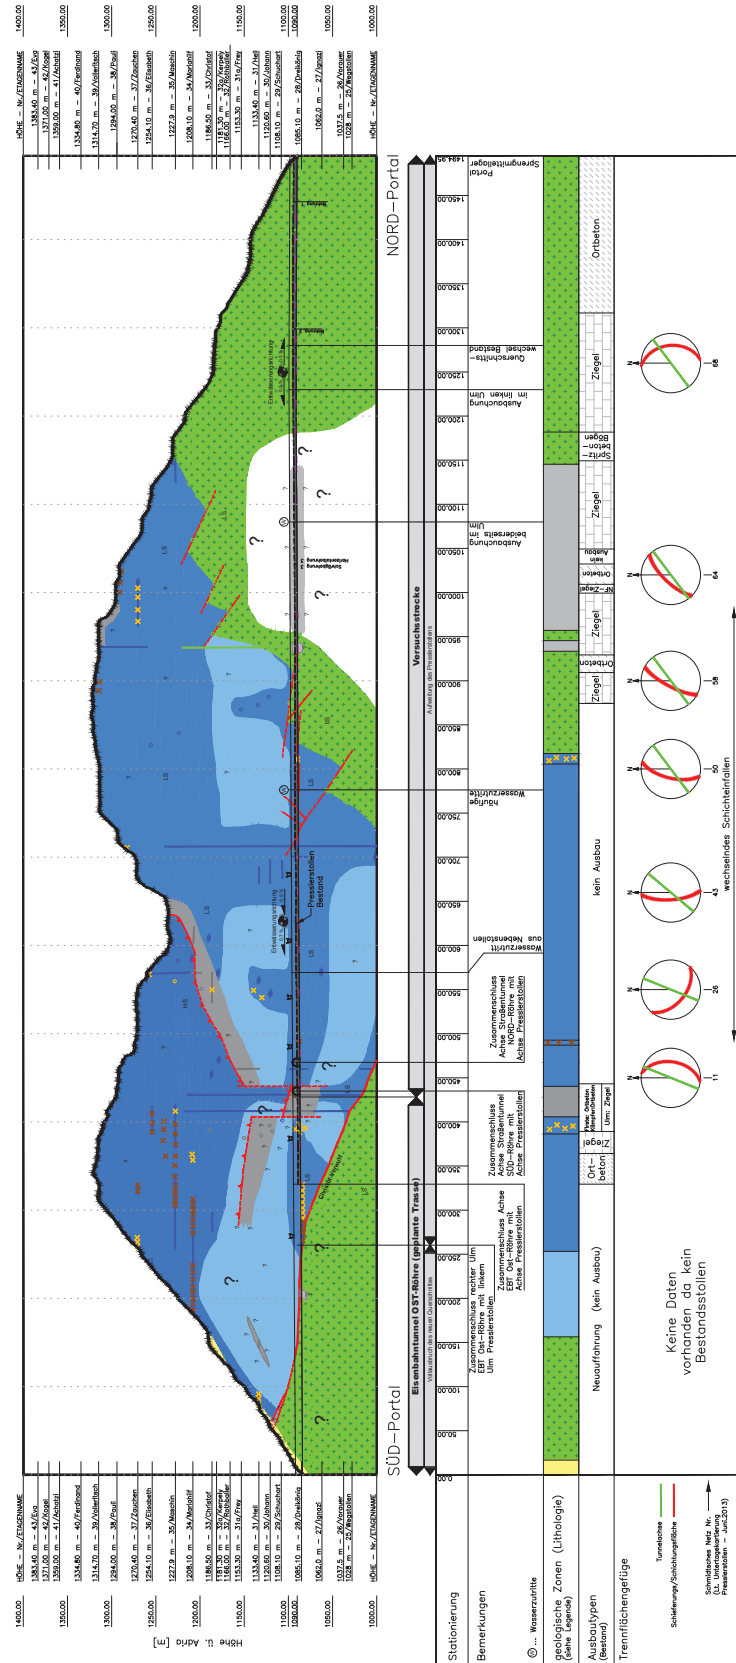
Longitudinal section of the east tube of the rail tunnel and the test tunnel (tender design)
